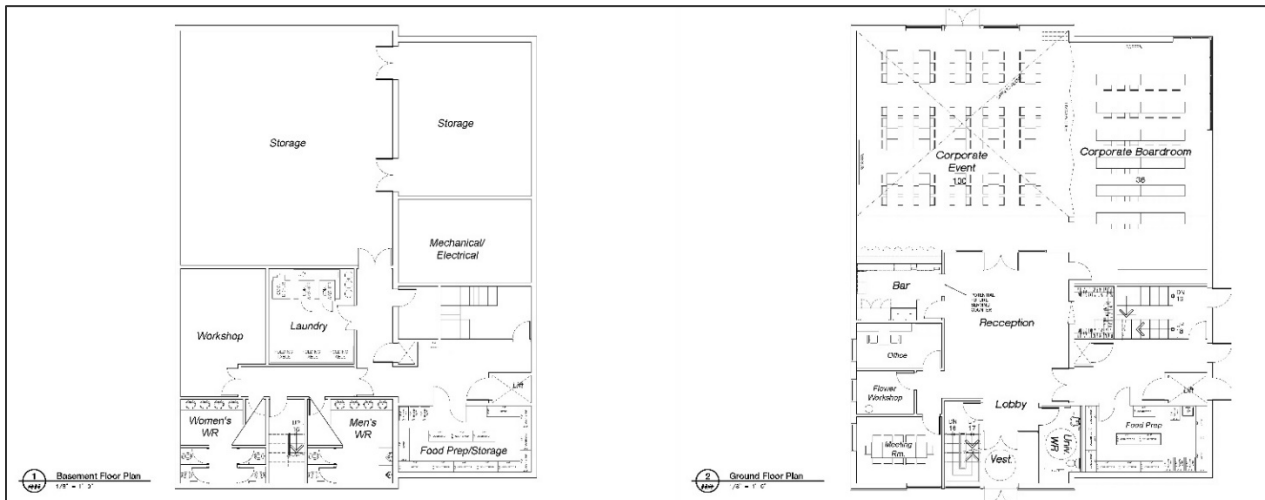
Corporate Event Venue Floor Plans, Basement and Ground Floor (source: Shoalts & Zaback Architects)
